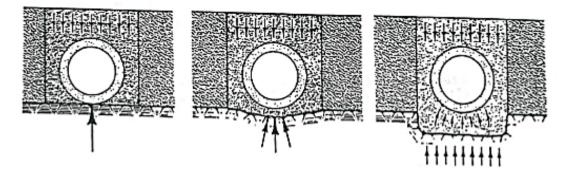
Pipe Installed on Rocks (Allen 2013)
